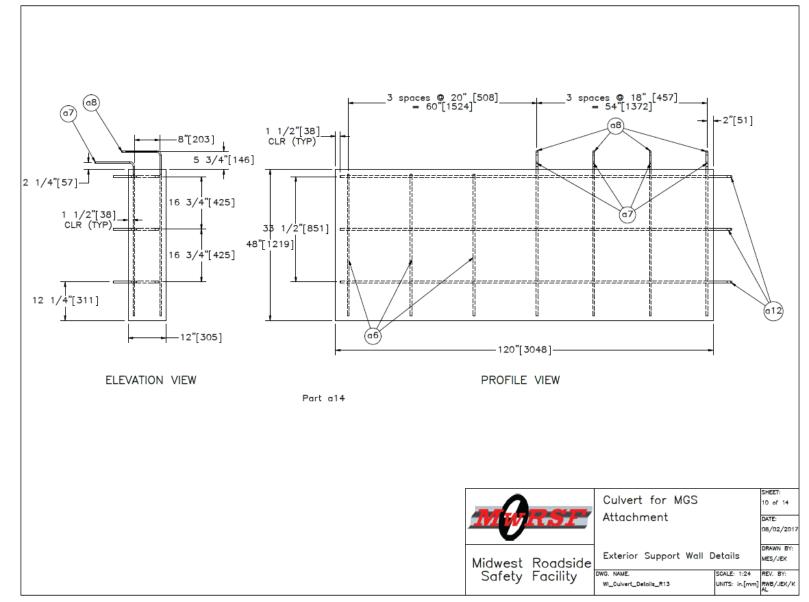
Exterior Support Wall Details, Test Nos. CMGS-1 and CMGS-2
